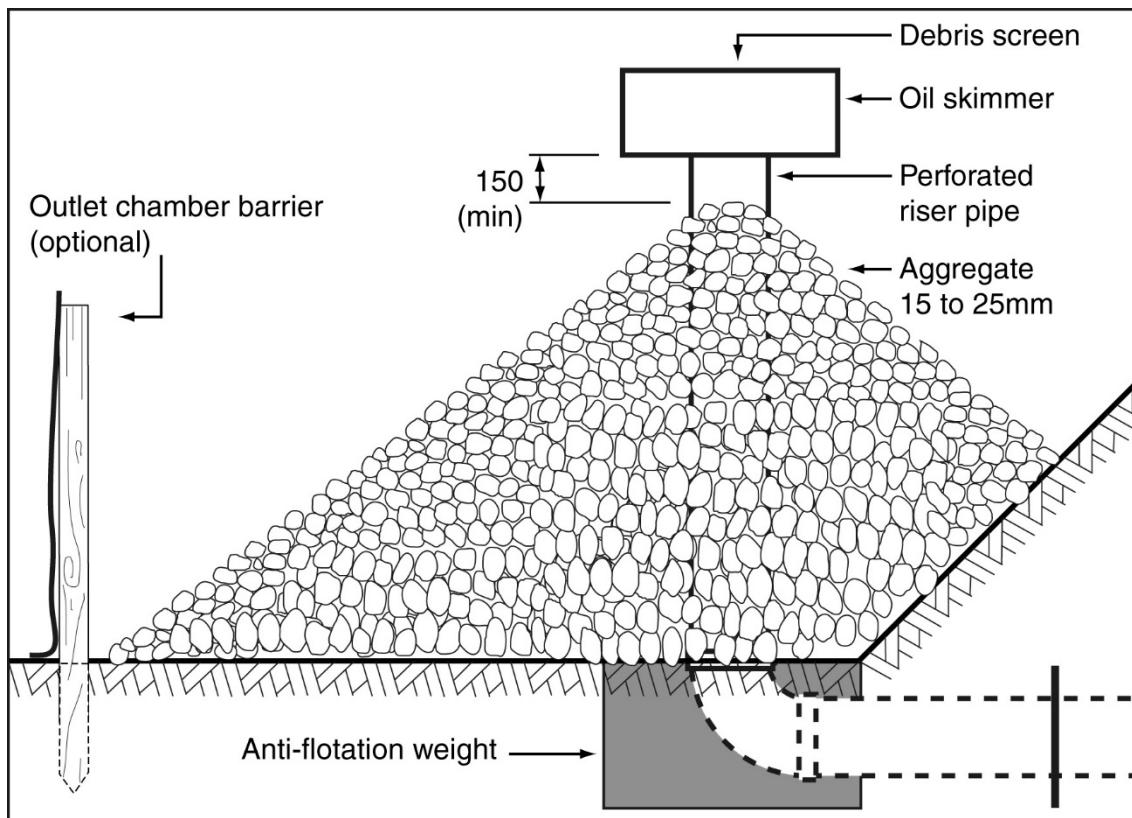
Typical details of riser pipe outlet with aggregate filter
